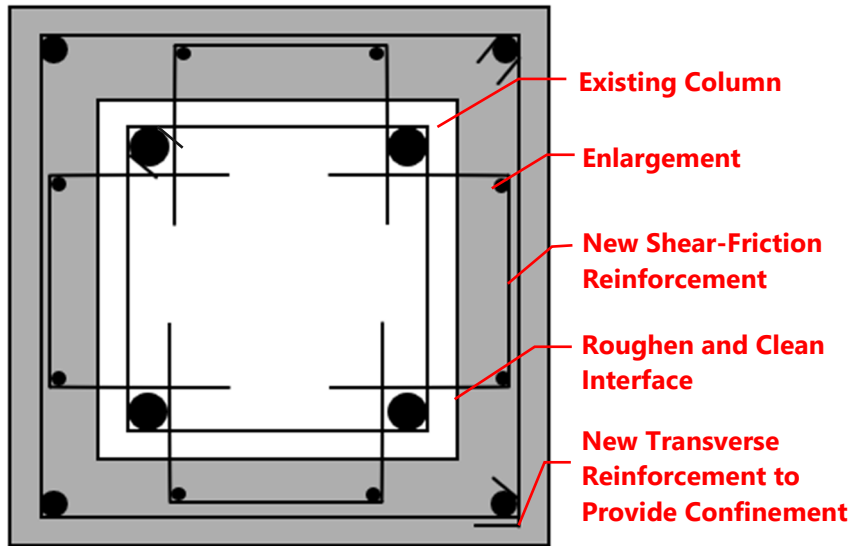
Sectional view of a reinforced concrete column which is enlarged to increase resistance. Note that the new transverse reinforcement should be spaced closely to provide confinement
